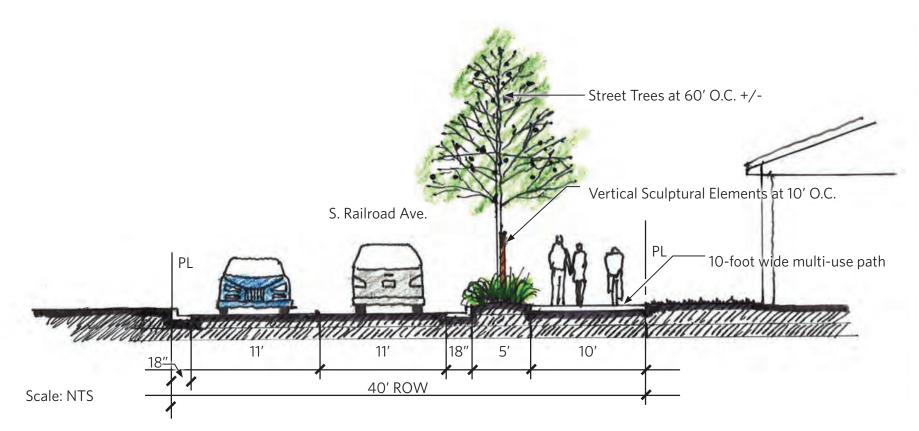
B. Section A: Looking North on S. Railroad Ave
